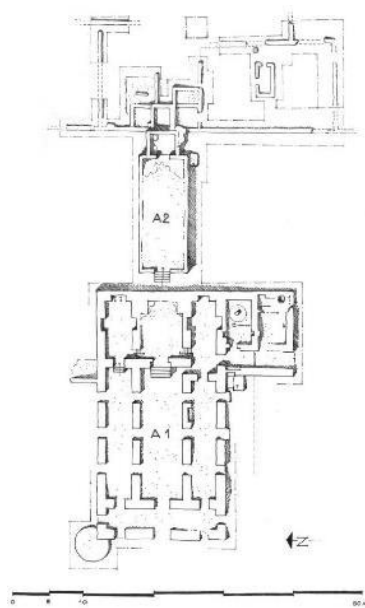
Plans of churches A1 and A2 at al-Qusur
